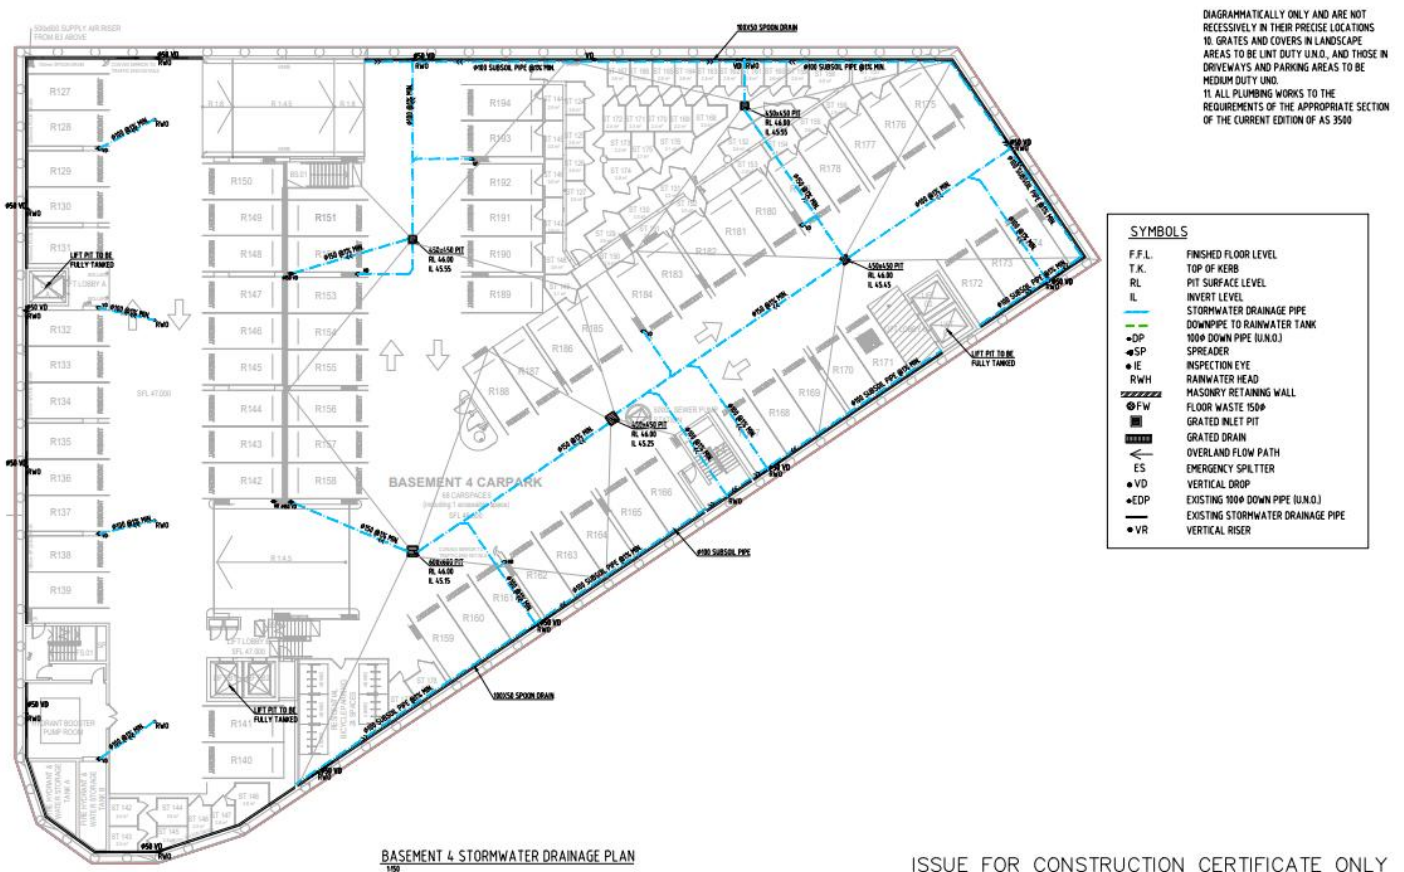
Basement 4 of the Stormwater Concept Plan showing spoon drain along the perimeter of the basement as well as grated stormwater pits (Source: TQM Consulting Engineers, 2025)
